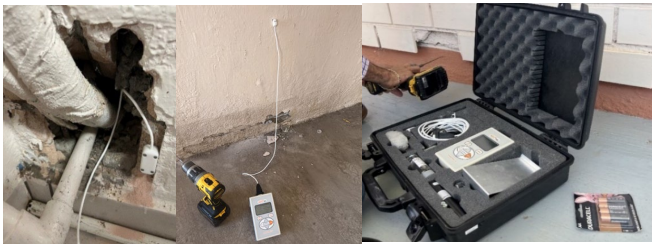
Measurement of thermal conductivity in a concrete wall and a hollow brick block wall. Own photographs, 2022.
